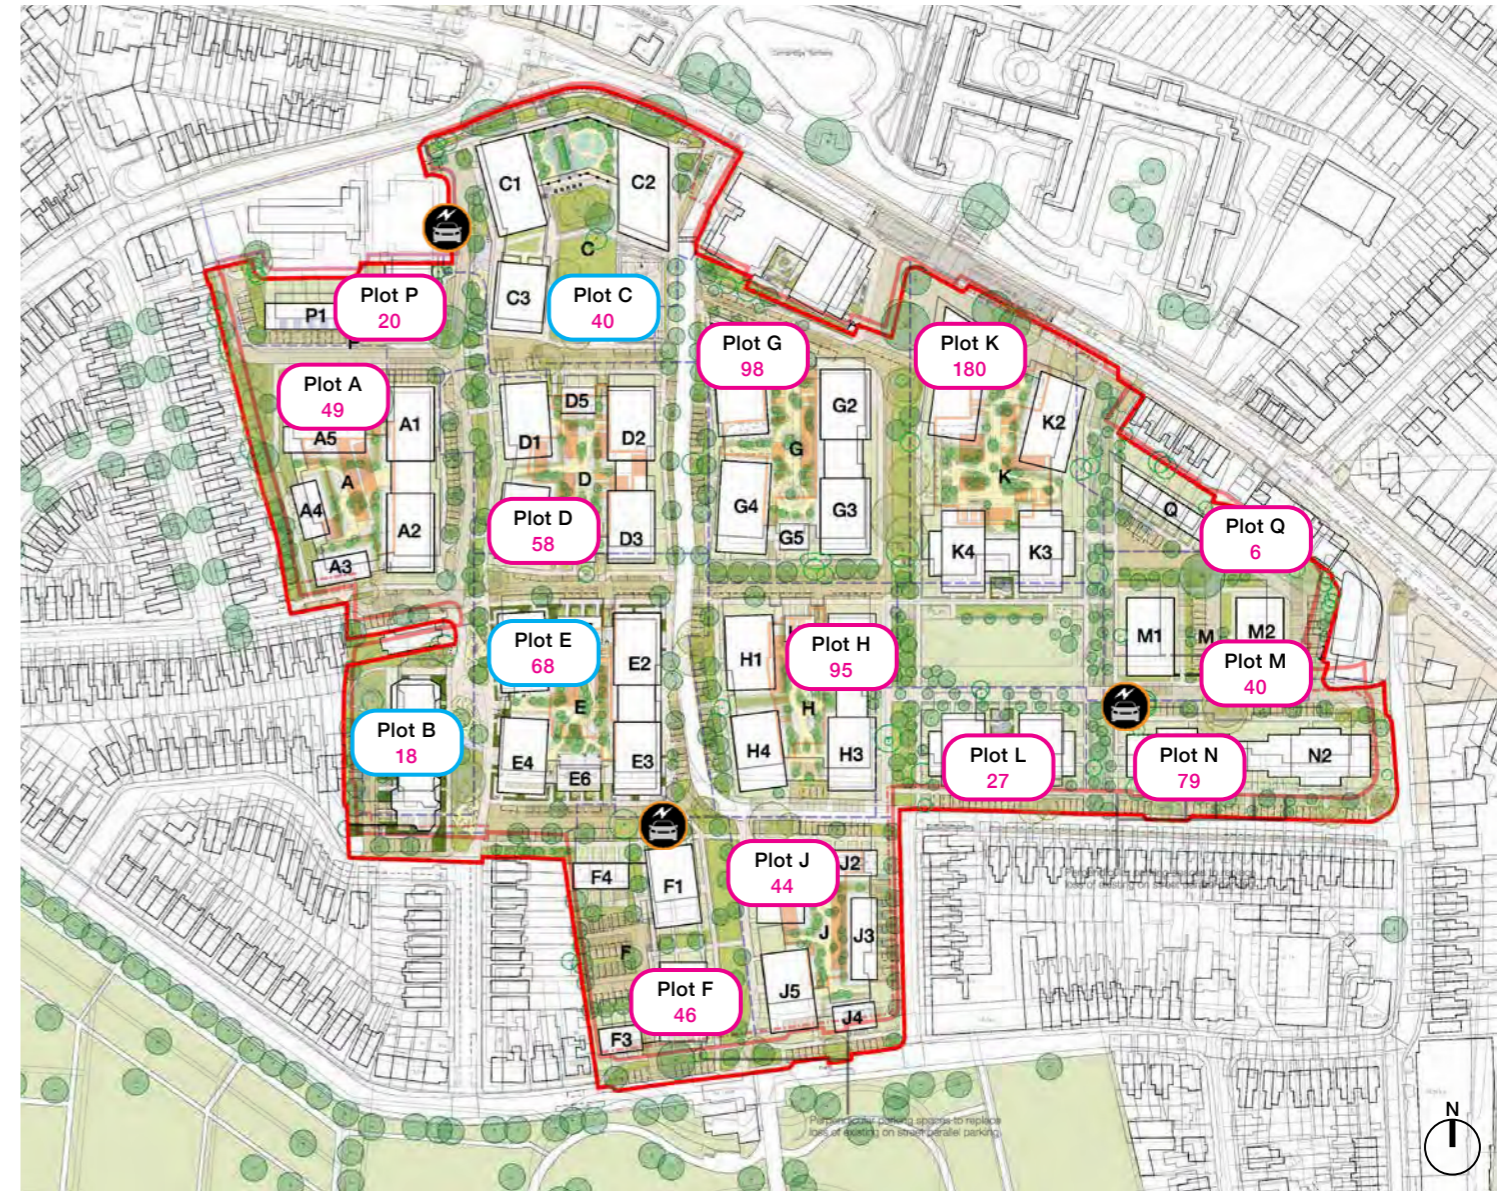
Masterplan showing parking space allocation to individual plots, on-street and secure off-street parking, Zipcar locations and EV fast charging points.
